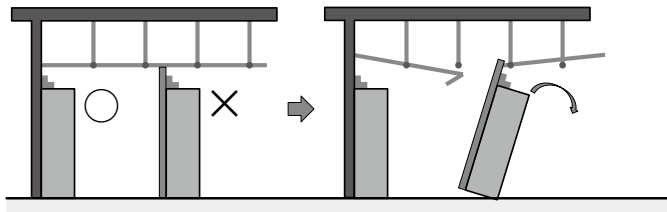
Heavy furniture fixed to a partition wall which was installed after the ceiling work may damage the wall and the ceiling and overturn during an earthquake.
